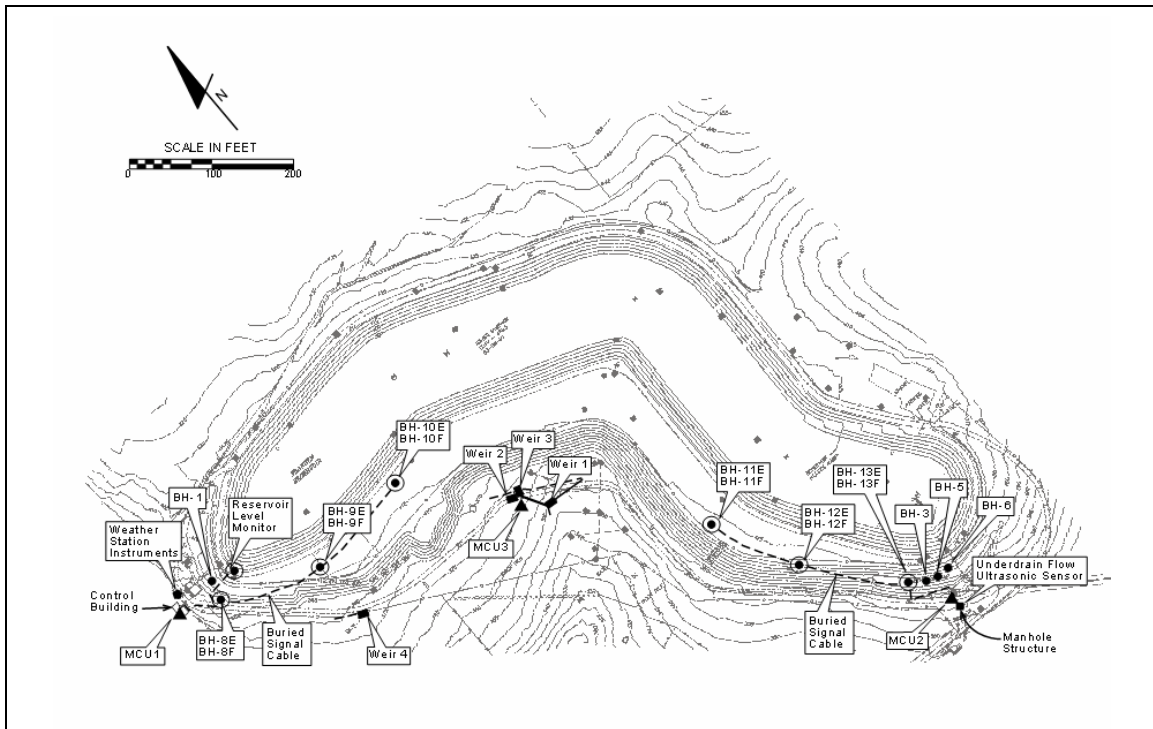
Franzen Reservoir Site Plan and General Layout for the Short Term Monitoring System
